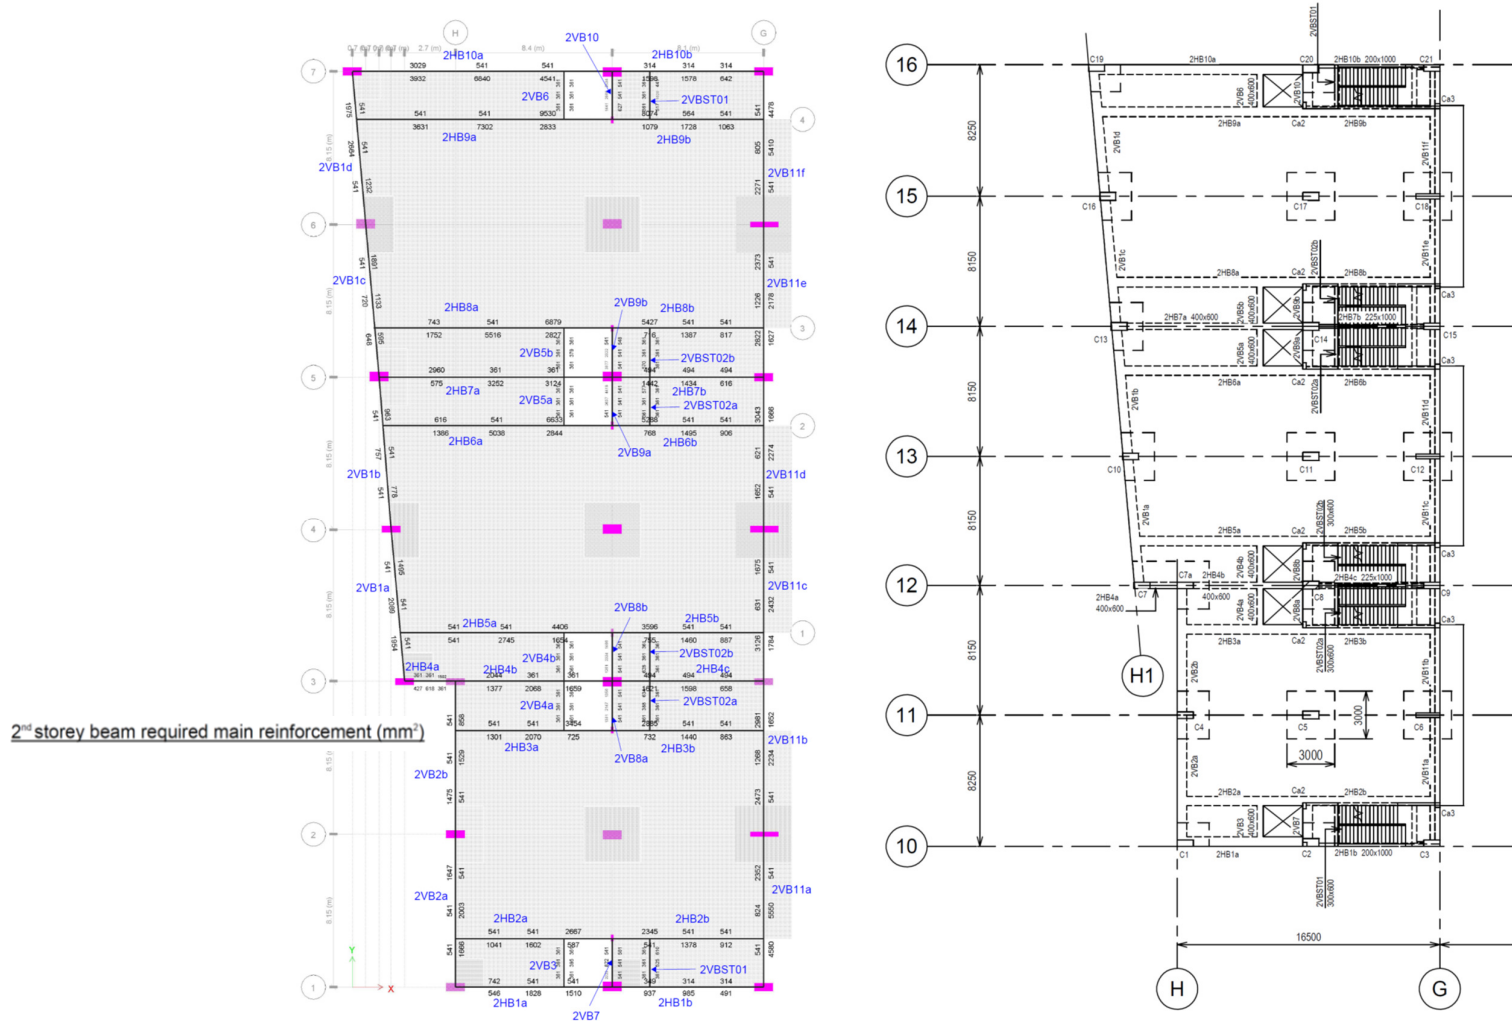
Summary of beam design with the beam labels in one plan (same as structural plan)
